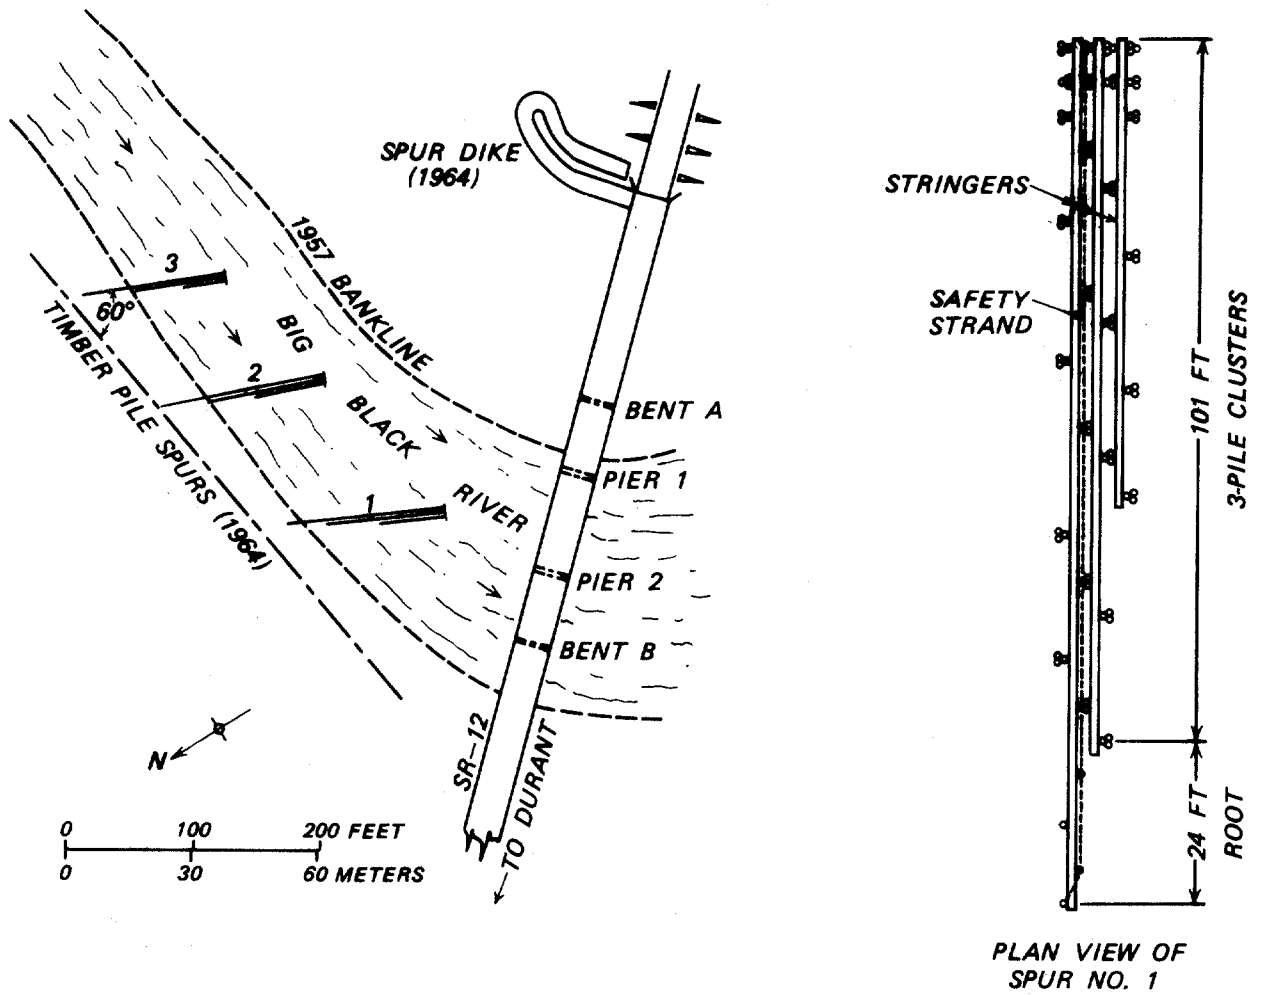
Plan sketch showing spurs installed at SR-12 crossing.
